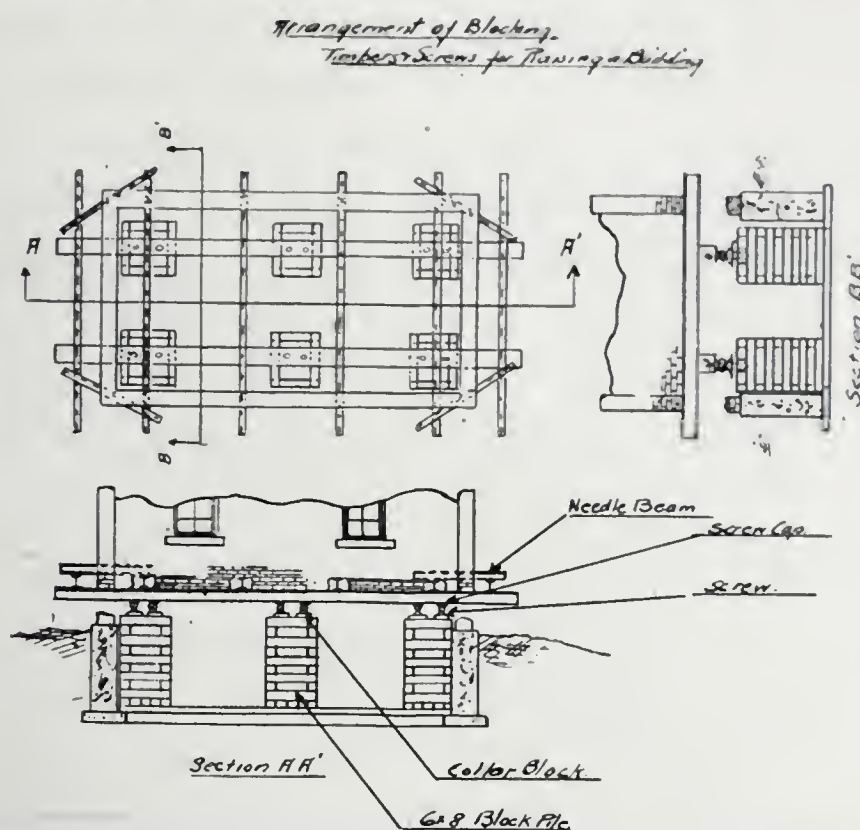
Arrangement of Blocking, Timbers and Screws for Raising a Building.
